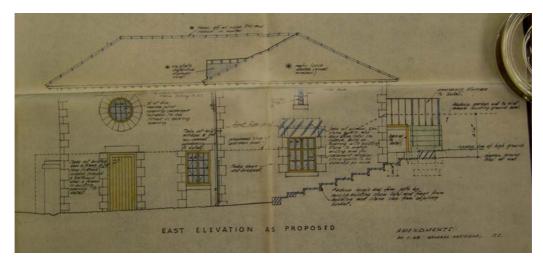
Coach House east elevation as proposed in 1966 (BDB 33/12/9 1966-9)
